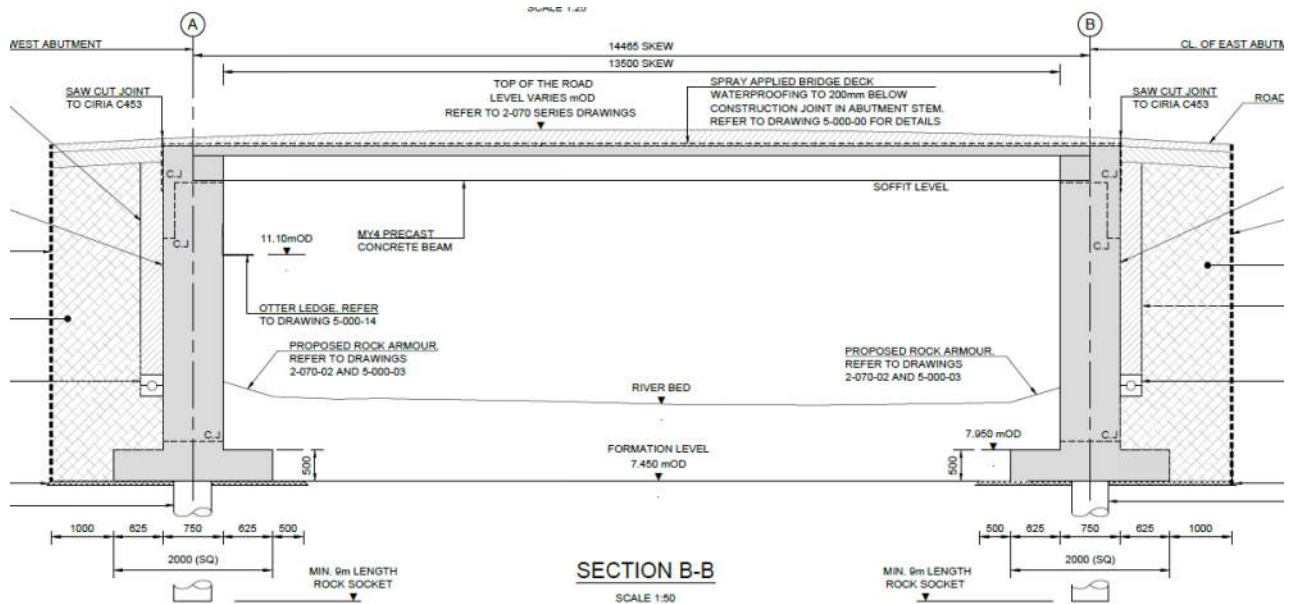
Hazelwood Shopping Centre Bridge Typical Cross Section
